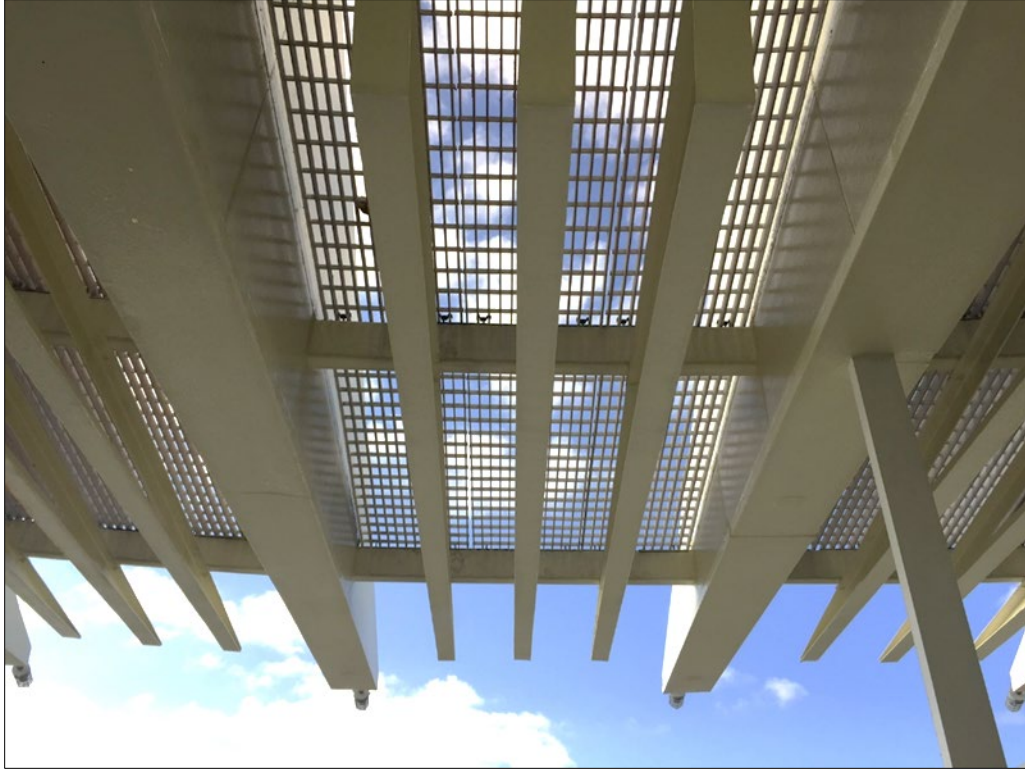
Pier 66 Hotel Tower. Crown outriggers. Camera facing up and northwest. Photograph taken October, 2017.
